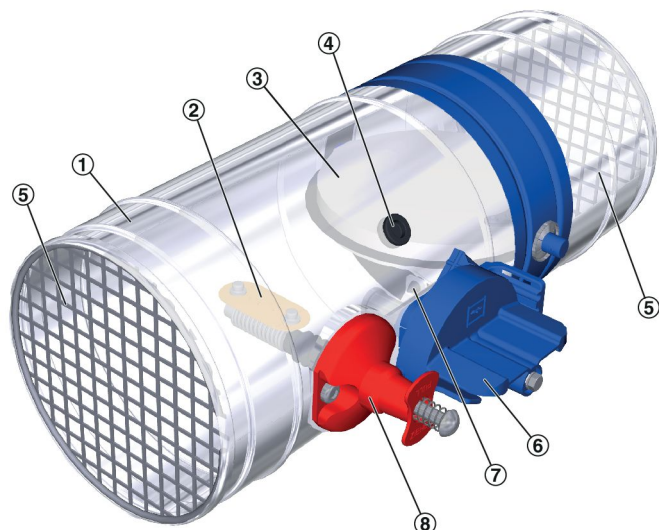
FKRS-EU with fusible link and cover grille used as an air transfer unit
